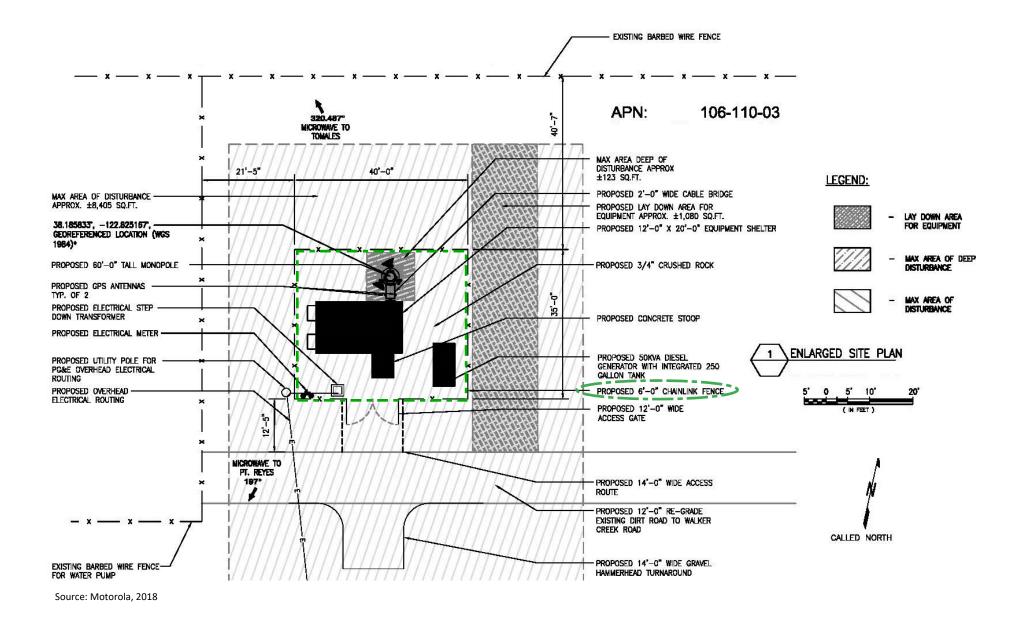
Site 21 - Coyote Peak Detailed Site Plan
